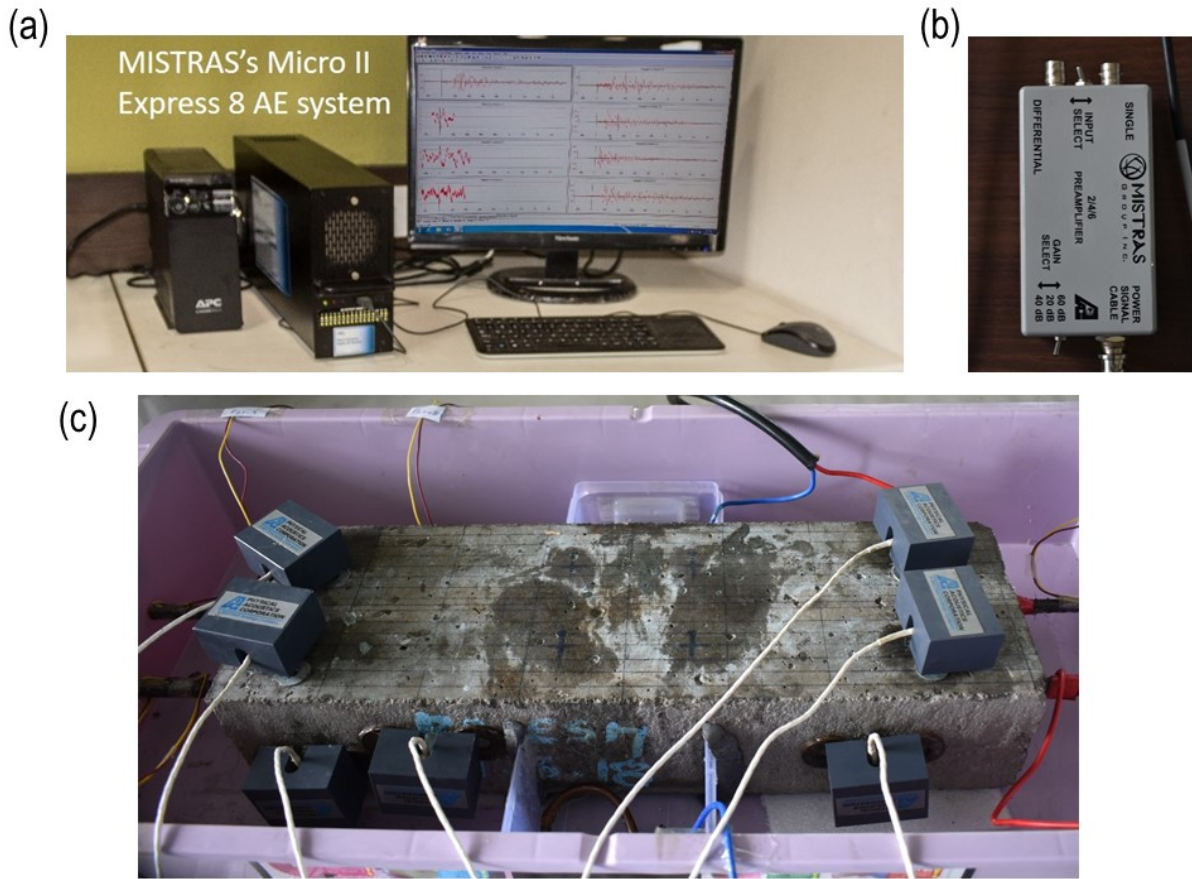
AE system used for corrosion monitoring at IIT Bombay, Structural Health Monitoring and Retrofitting Lab that includes (a) controlling unit, (b) preamplifiers and (c) sensor arrangement on concrete beam.
